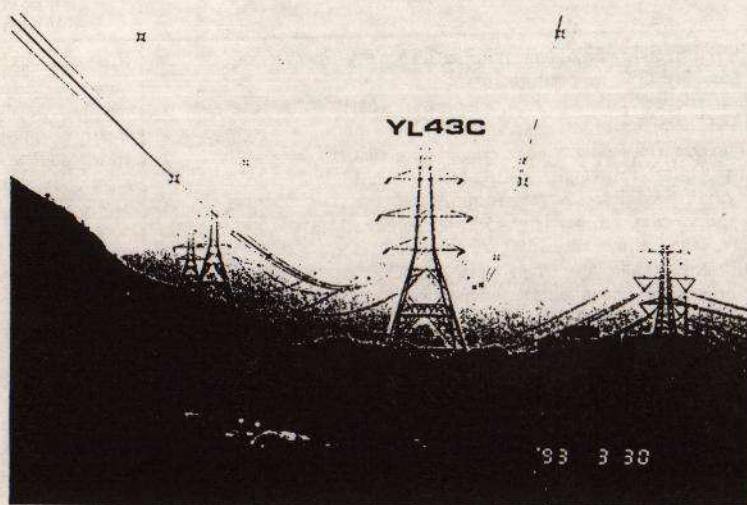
Standing under Tower YL42 & Looking towards Tower YL43C
